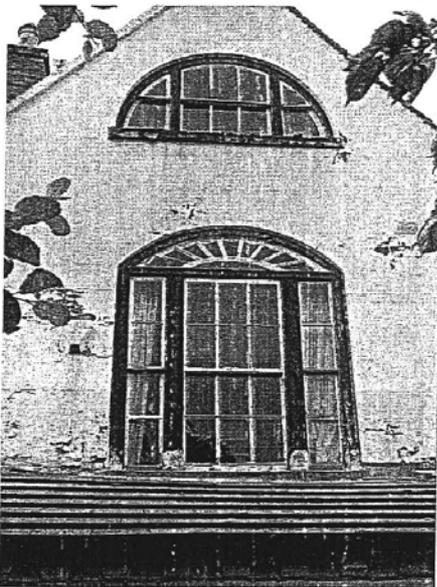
Regency windows in rear elevation - north side: w.15 on 1st floor and w.20 above.
